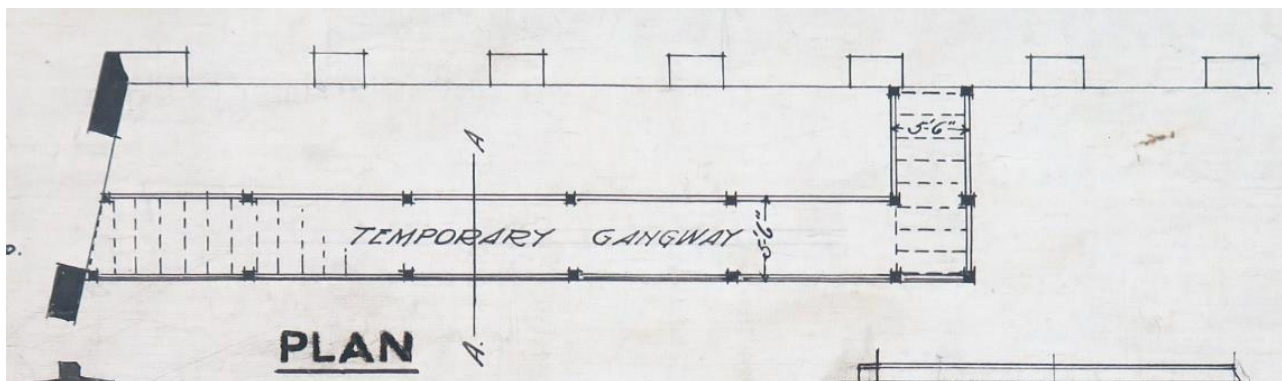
1916 George McRae proposed Plans – Elevation of temporary gangway
